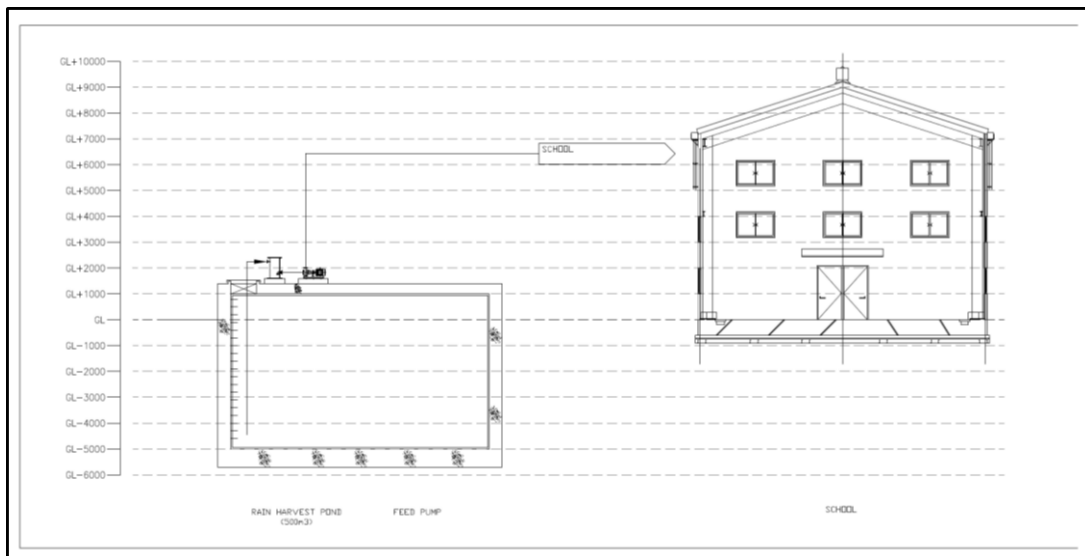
Typical section drawings of Proposed Rainwater harvesting system
